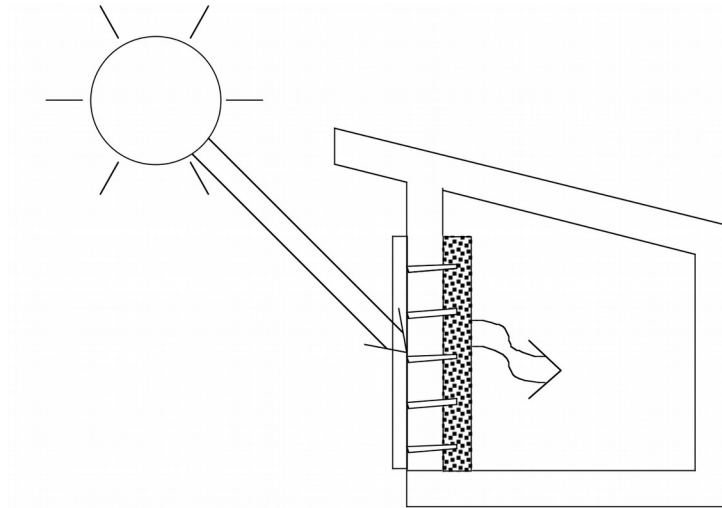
Schematic of the solar heat pipe system. Heat pipes provide one-way heat transfer from the absorber on the outside of the insulated wall to the storage medium inside the building.
